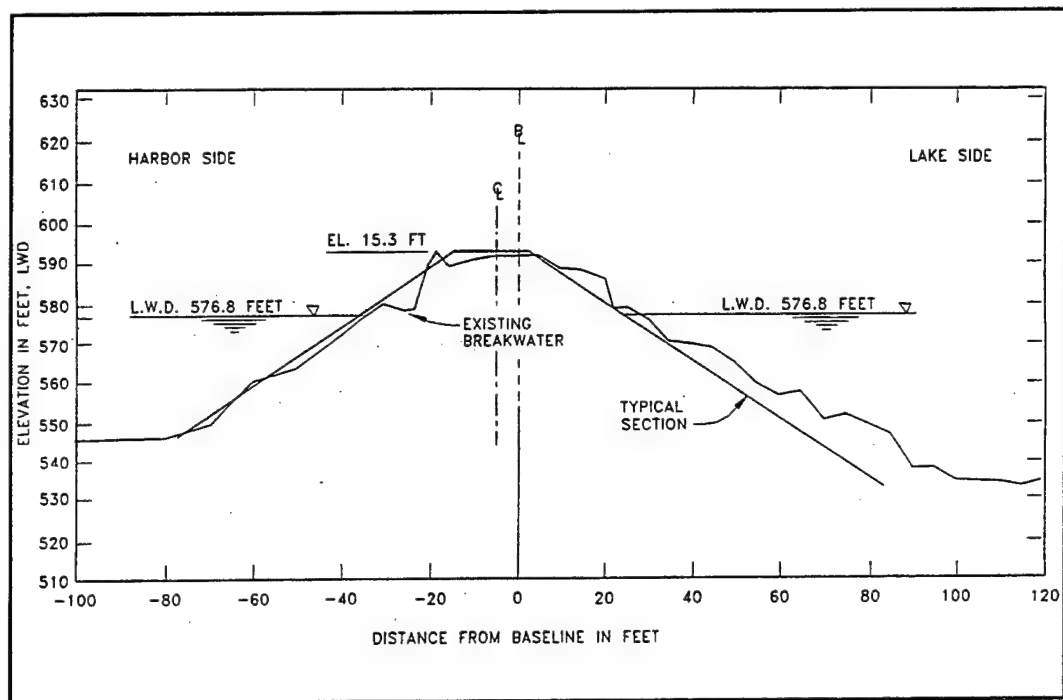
1985 Survey cross section, Station 34 + 00
